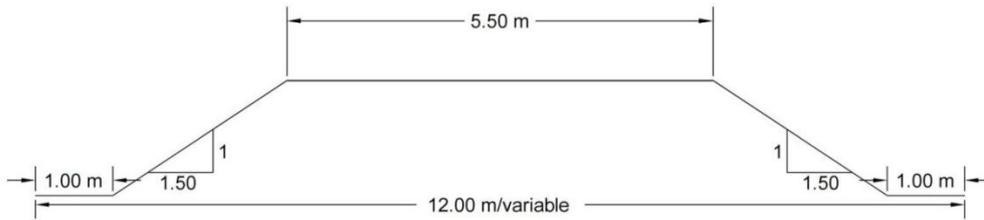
Cross Section of Proposed 4-Lane Access Roads
